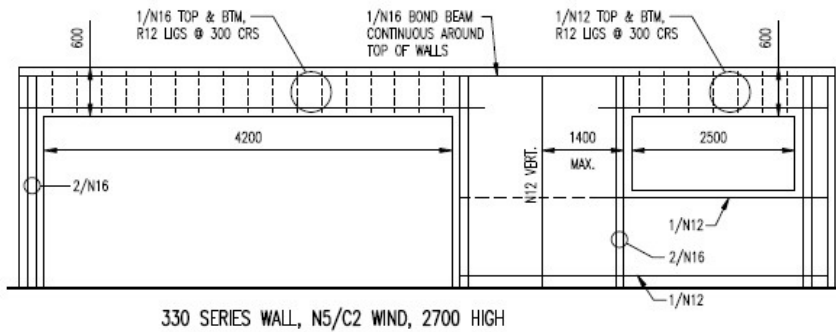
2700 High Wall, N5/C2 Wind Rating, 330 Series ECO-Block (Max. roof load width: 7.2m)
